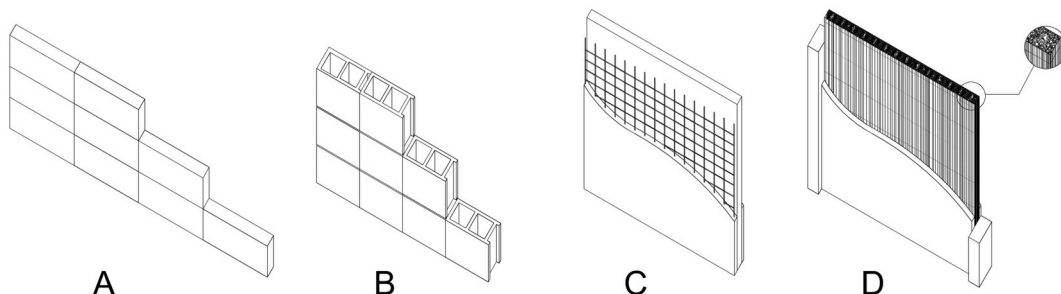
View of the four wall technologies; (a) autoclaved aerated concrete block, (b) concrete masonry unit, (c) 3D sandwich panel wall, and (d) pressed reeds panel.
